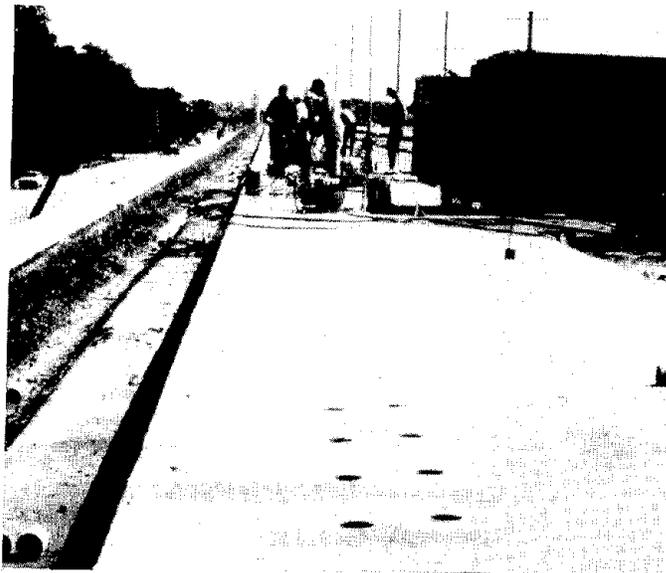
DRILLING HOLES FOR FASTENER INSERTS
